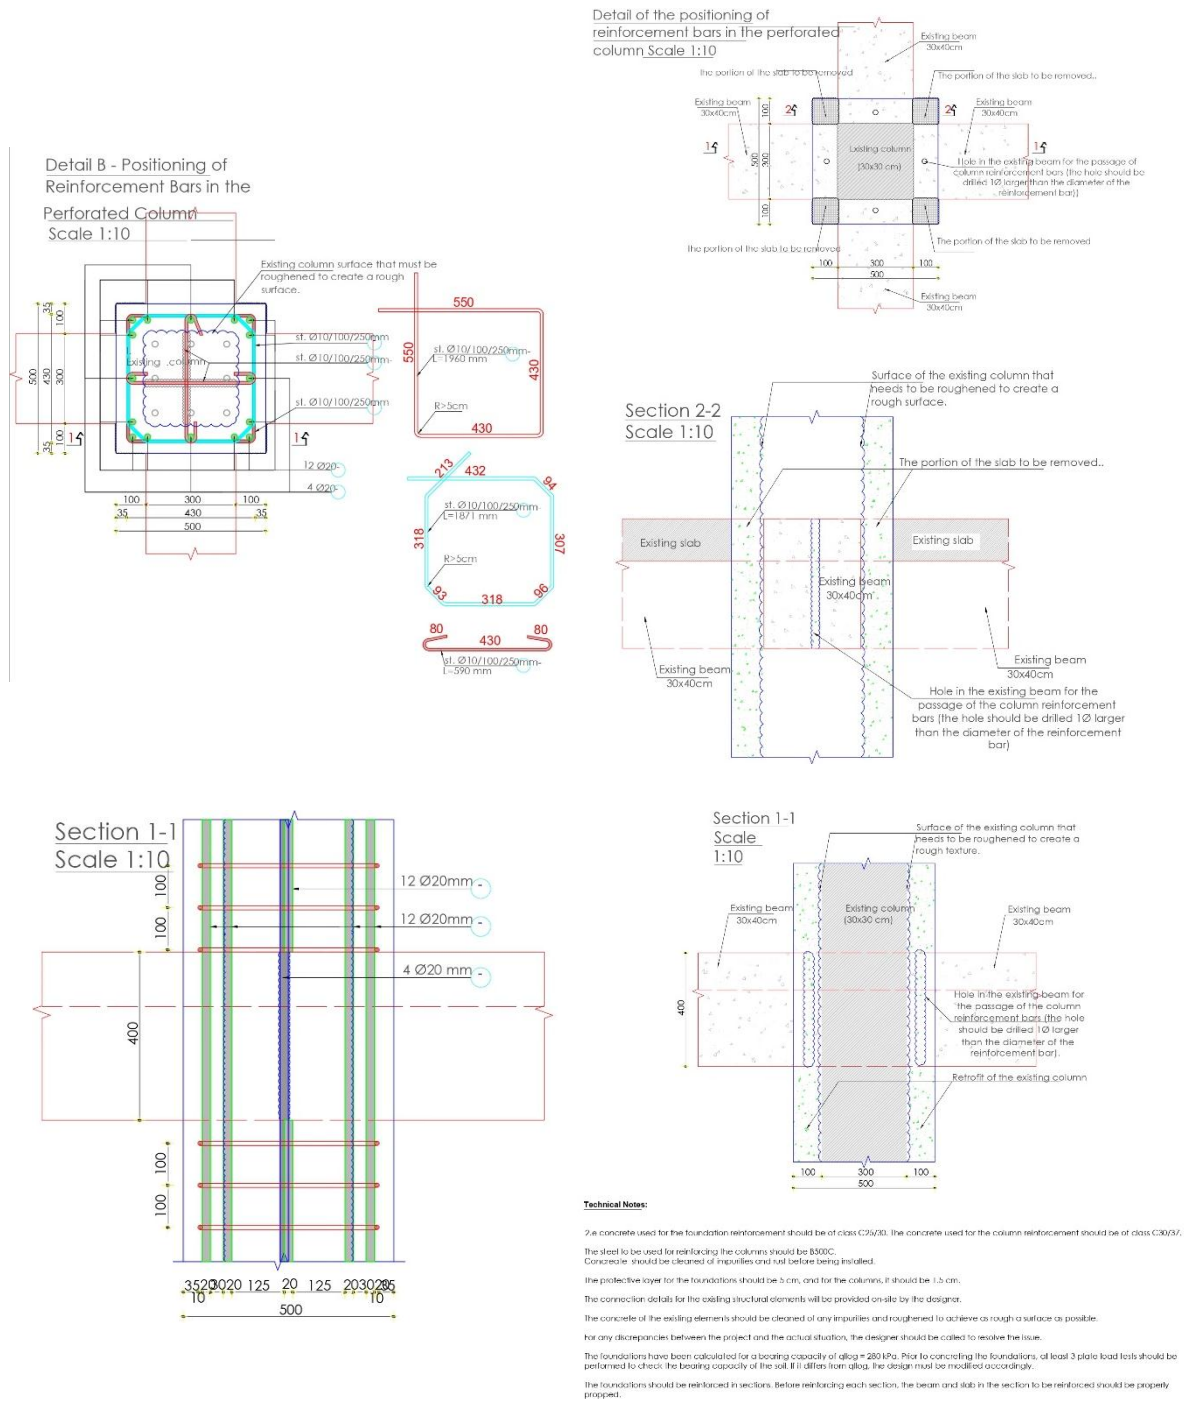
Details – Positioning of Reinforcement Bars in the Perforated Columns [2]
